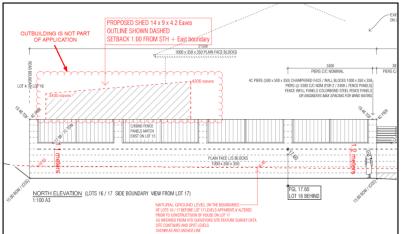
North elevation of retaining with mark-up of retaining height in red
